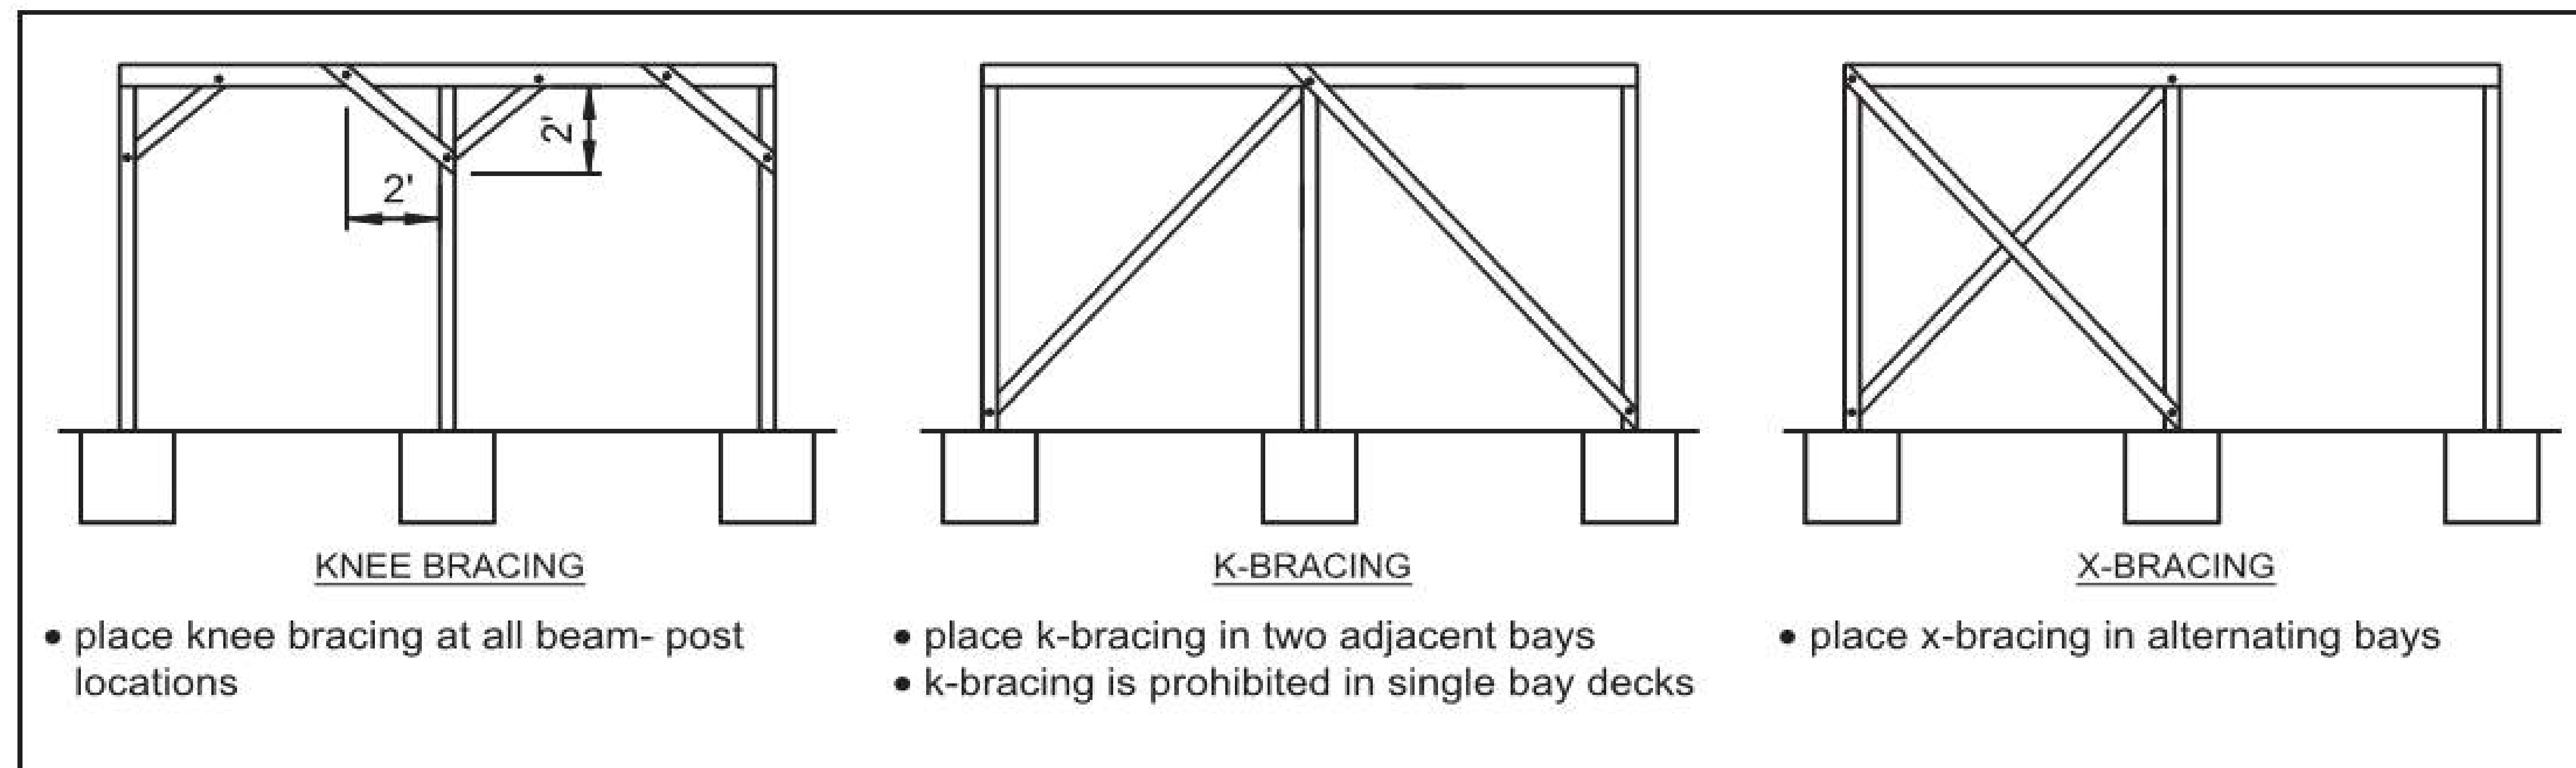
DIAGONAL BRACING AT BEAM-POST LOCATIONS
